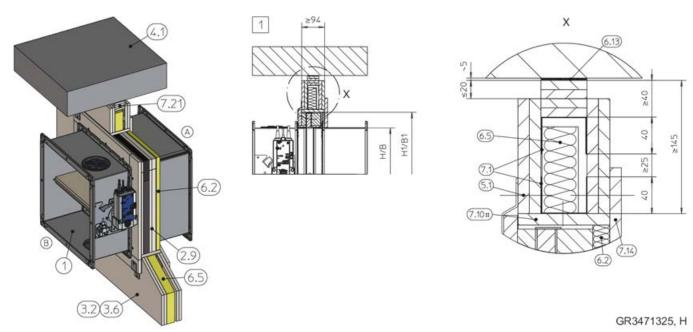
Dry mortarless installation into a lightweight partition wall, below a flexible ceiling joint
